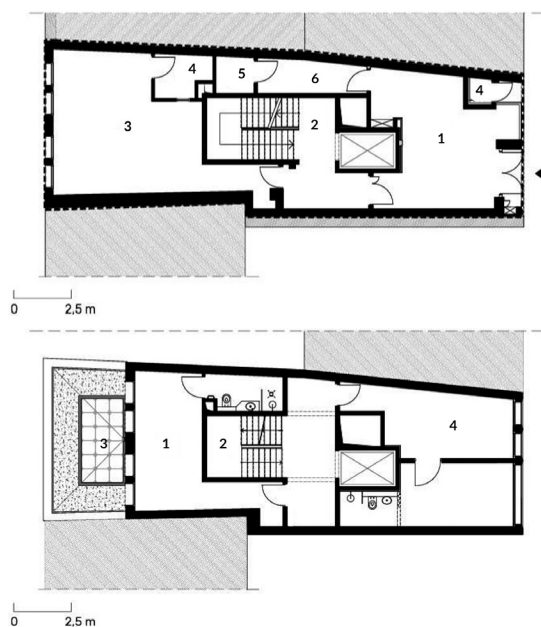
10 Warszawera St., Hotel Warszawski. Ground floor plan. Legend: 1 – reception hall; 2 – circulation; 3 – dining room; 4 – auxiliary room; 5 – technical room; 6 – kitchenette. Second floor plan. Legend: 1 – room; 2 – circulation; 3 – terrace (Brataniec, 2022)
